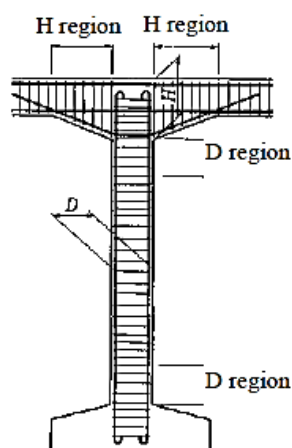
Reinforcement arrangement at inter support of rigid frame structure
